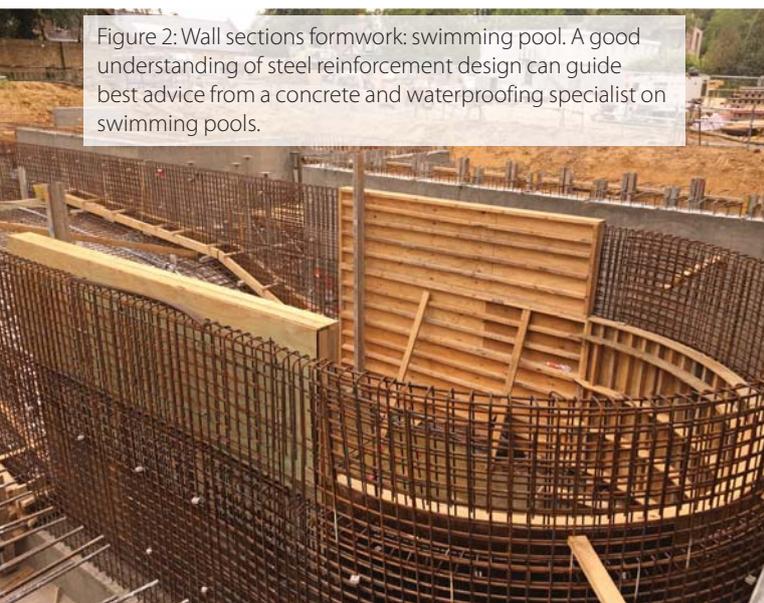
Wall sections formwork: swimming pool. A good understanding of steel reinforcement design can guide best advice from a concrete and waterproofing specialist on swimming pools.
